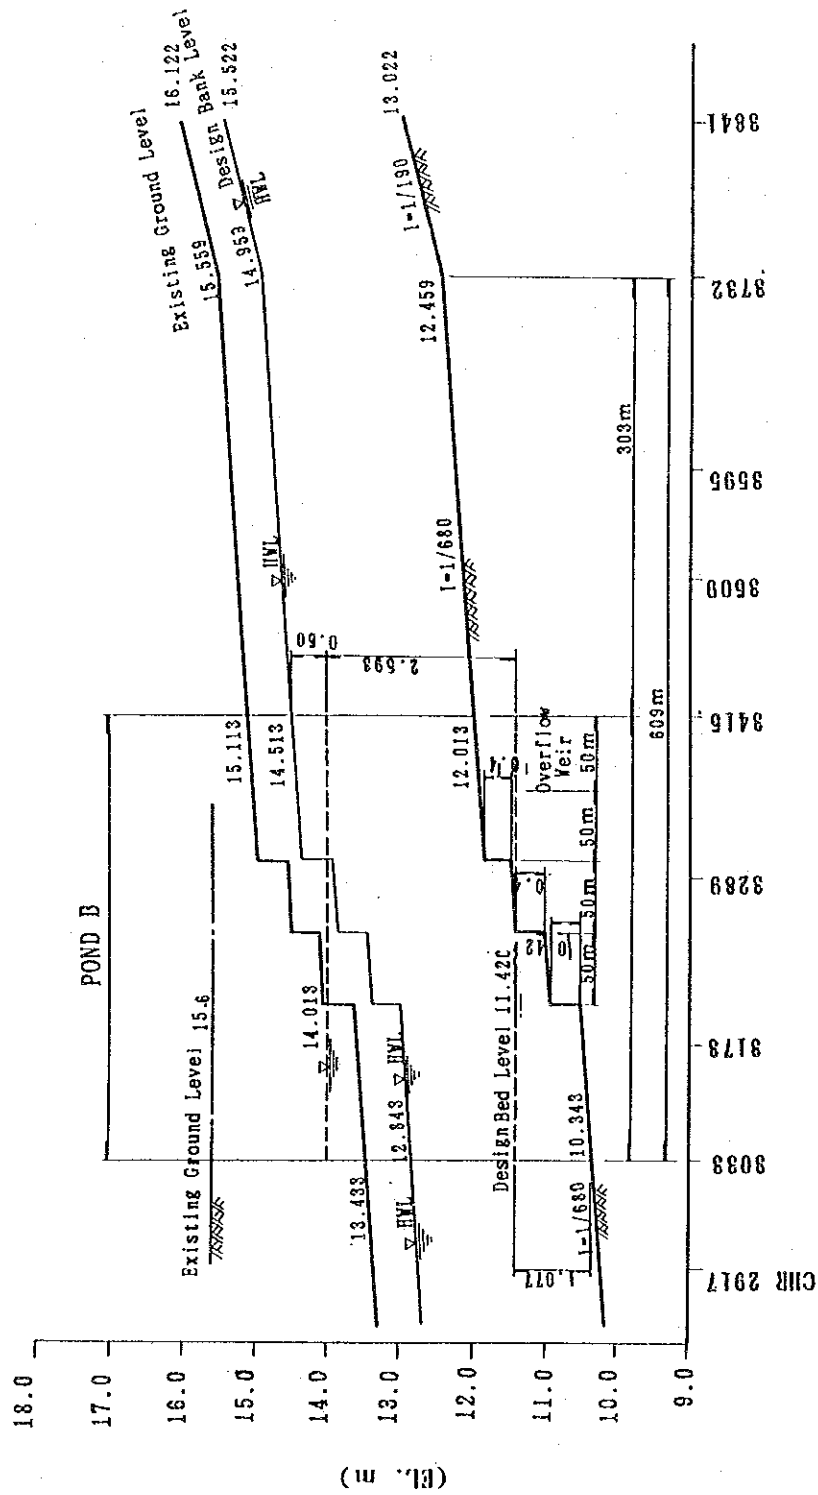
LONGITUDINAL PROFILE OF PROPOSED RETENTION POND B
